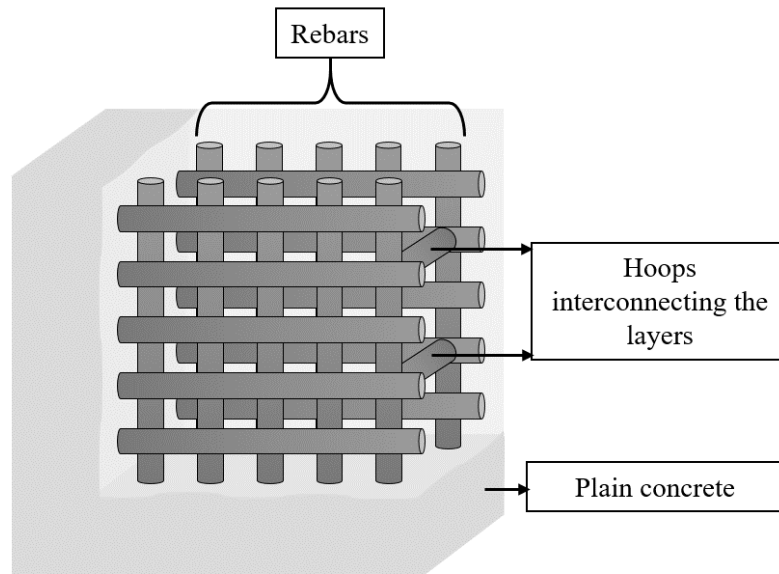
Double-layered reinforcing grid embedded in concrete.
